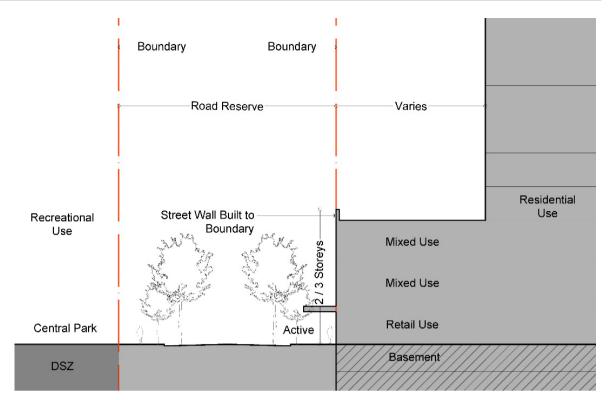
Street Wall Heights at Key Intersection
